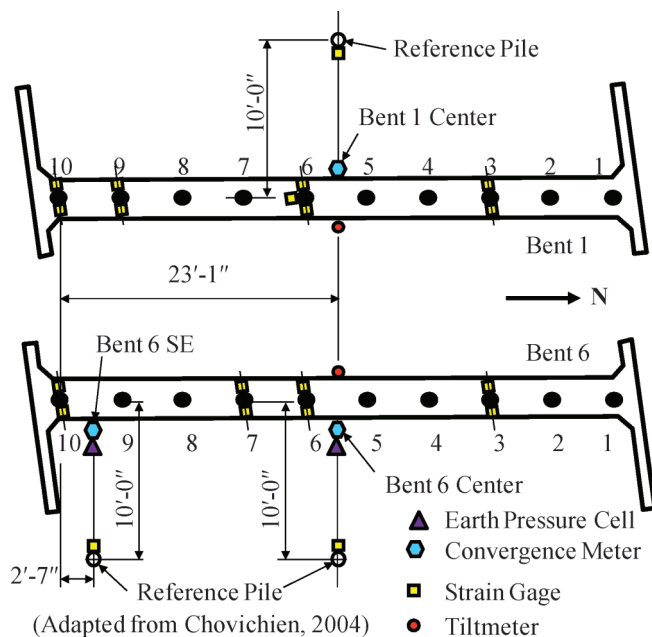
Plan View of SR-18 Abutment Instrumentation
